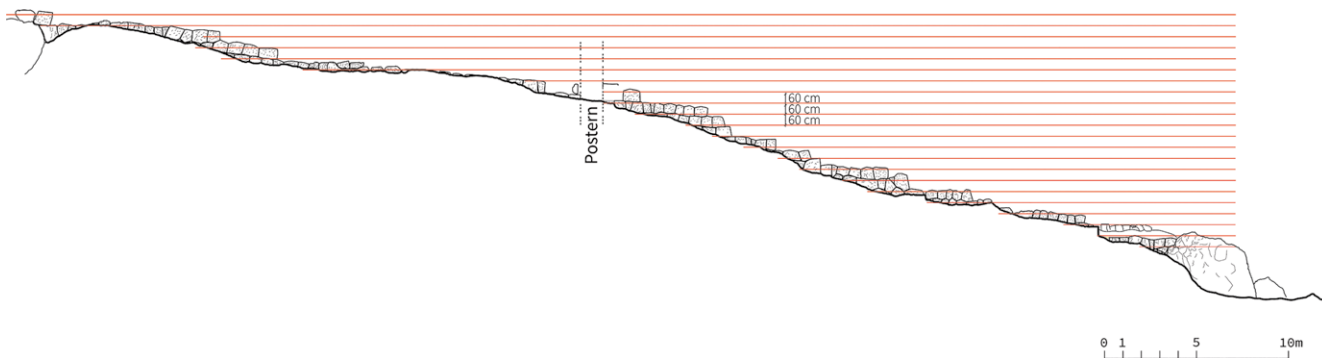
The three southernmost blocks of Wall C (of the East wall)
